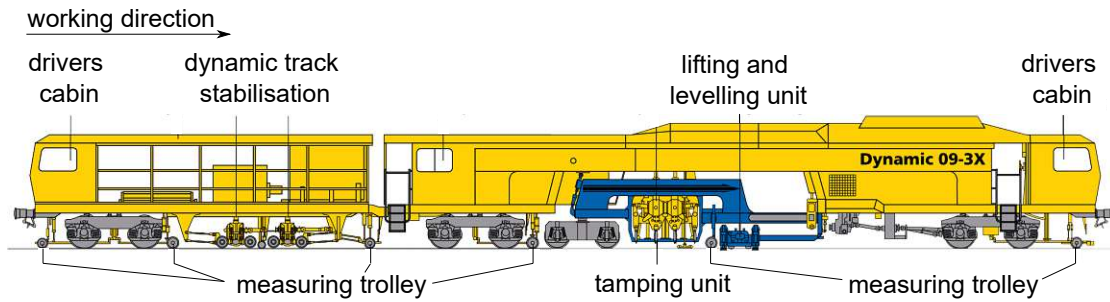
Tamping machine *Dynamic 09-3X* (©Plasser & Theurer)
